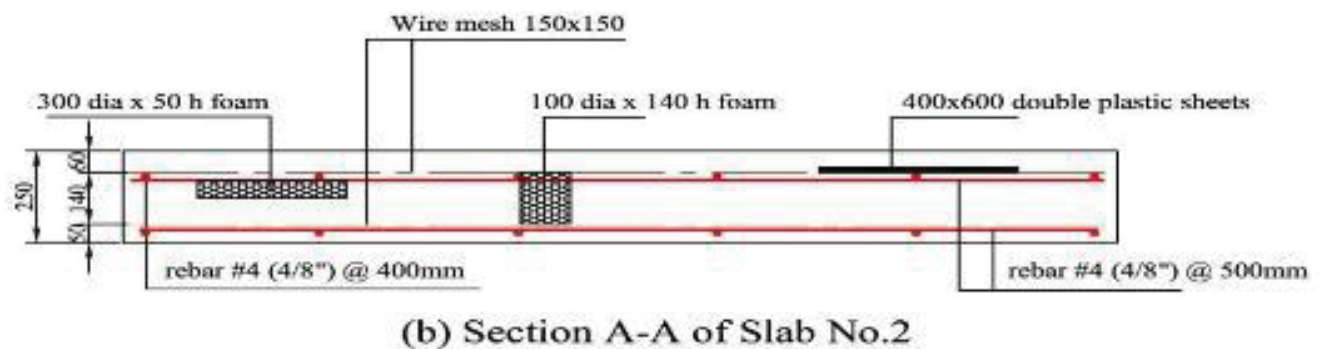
Design plan cross section of the center of the delamination slab. Units in metric millimeters, 1 in. = 25.4 mm.
